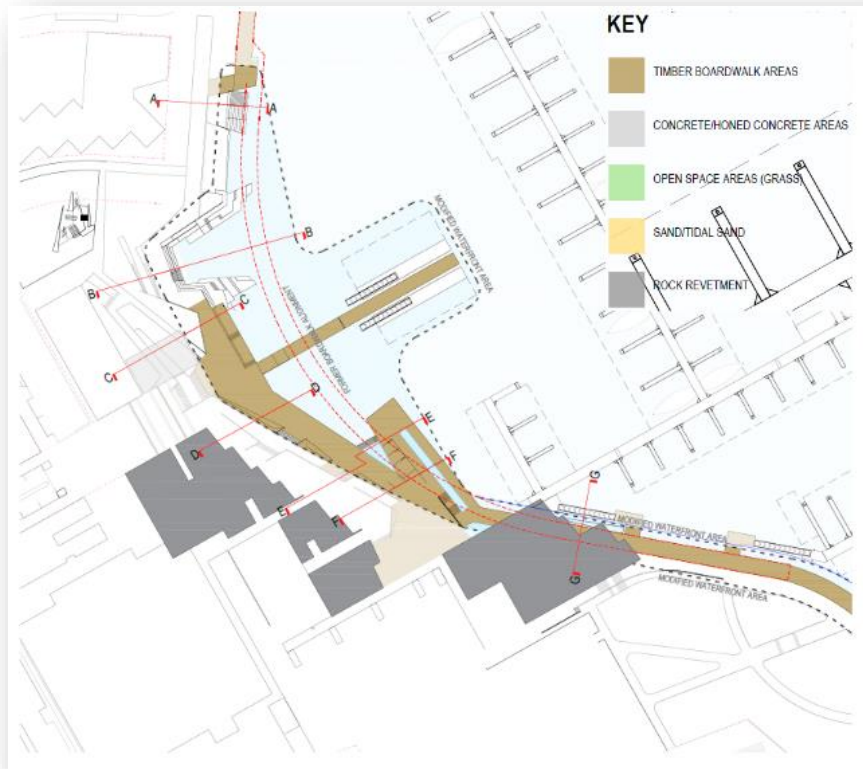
Marina Boardwalk Plans (approved as part of Mod 7)
